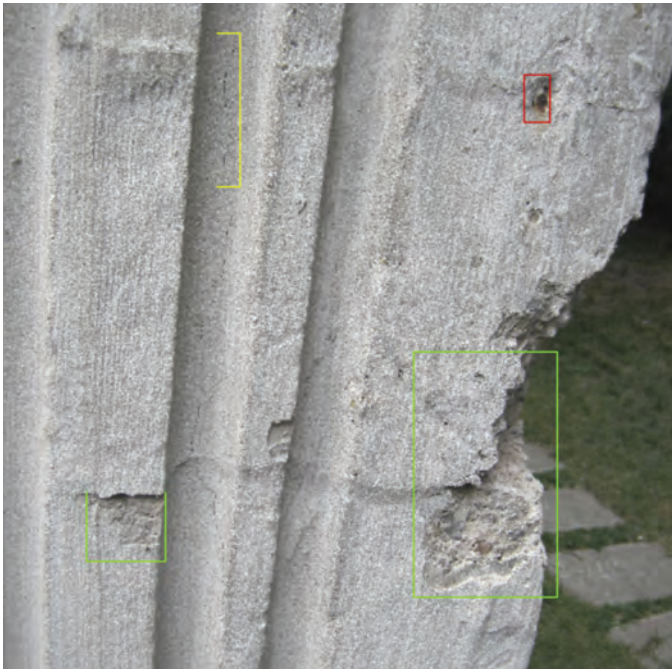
Example of AI condition detection (red boxes display detected exposed rebar, green—spall, yellow—crack).
